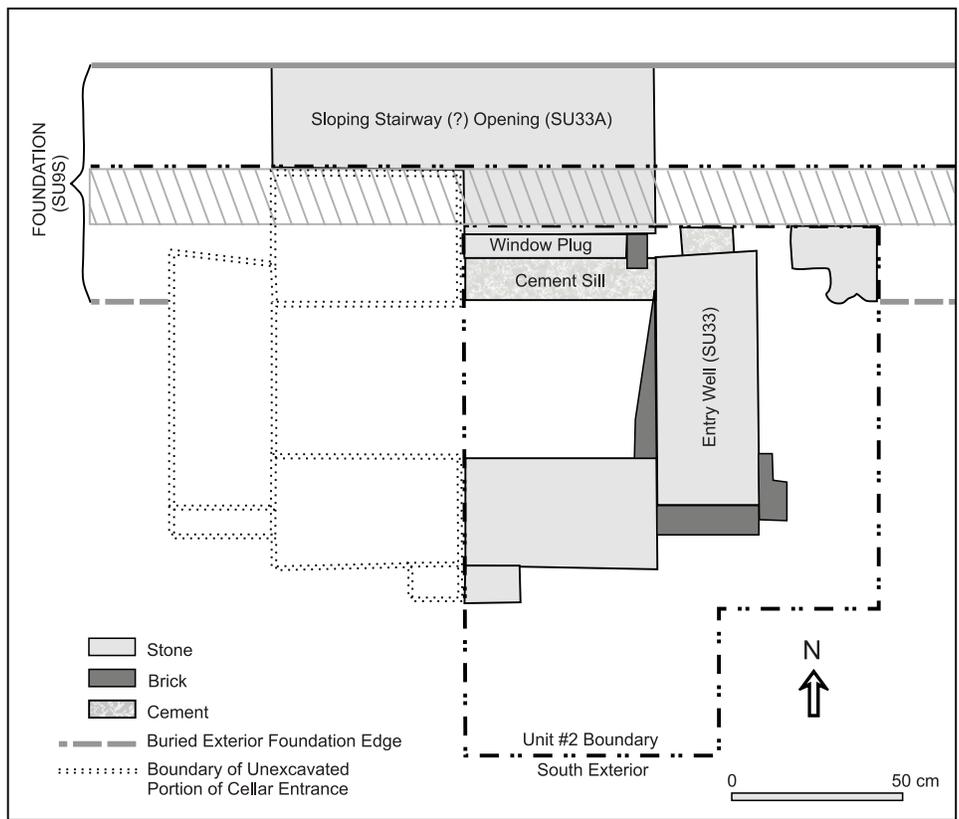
Stairwell or window well in Gas Holder basement's south wall. Note stone slab sealing the opening photograph.
